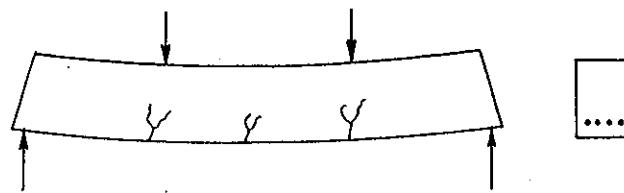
Failure Pattern of Over Reinforced Beam
